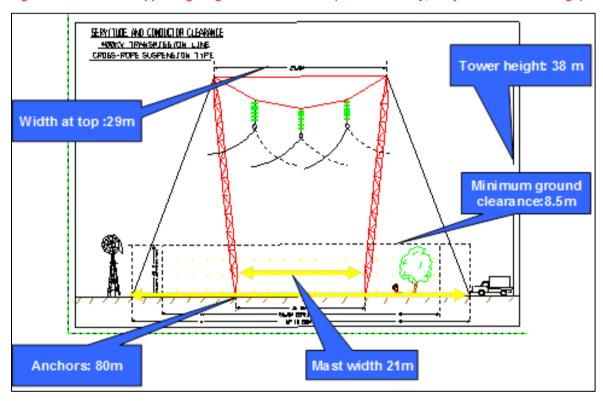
Cross Rope Suspension Structure (illustrative only, subject to detailed design)
